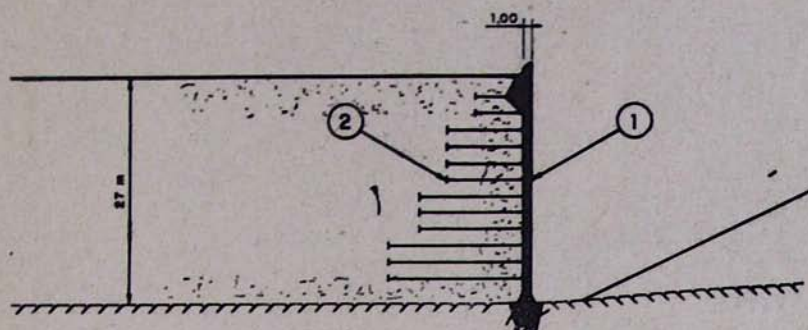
Typical section through *Mur à Echelles*; 1—Cast-in-place wall; 2—Anchor members with end anchor plates.
